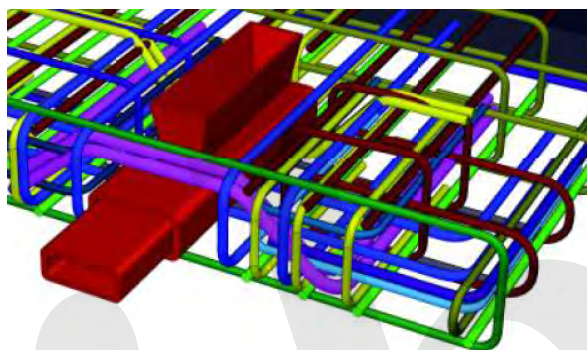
Example of sliding steel support with localised reinforcement.
